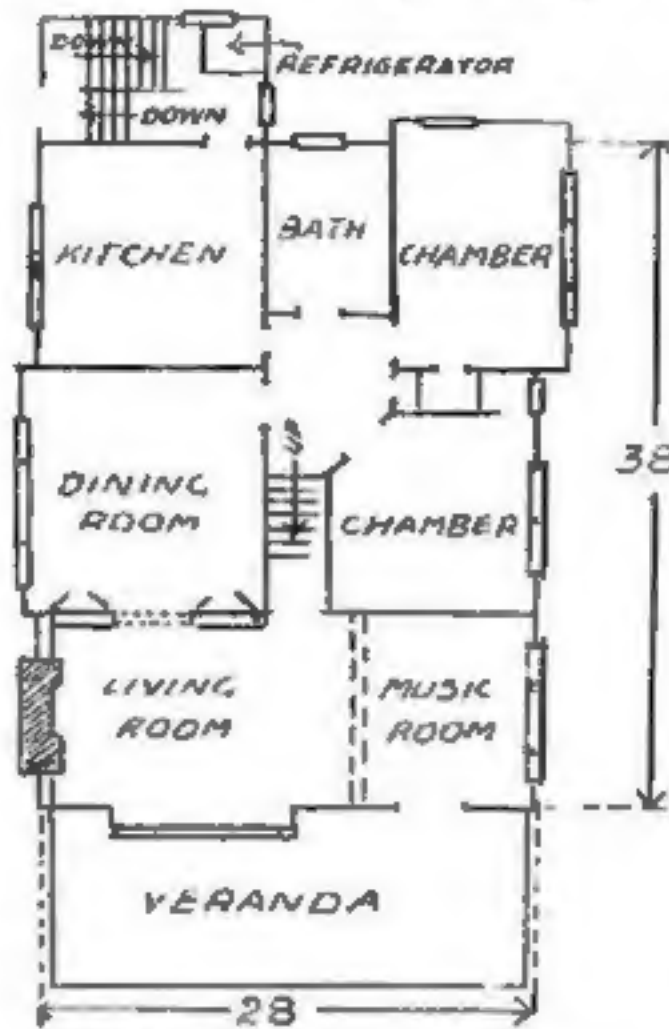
Floor plan of a successful bungalow, costing \$5,100 complete
